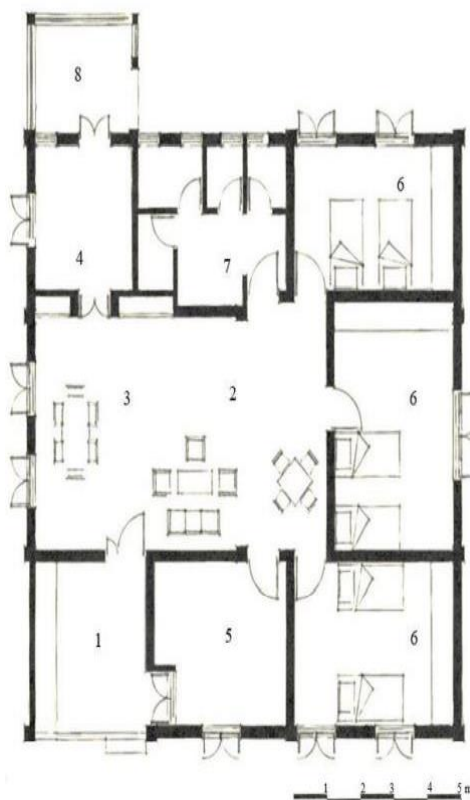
Plan of House – SOS Children's Village- Piliyandala [Drawing](Source –By Author)
